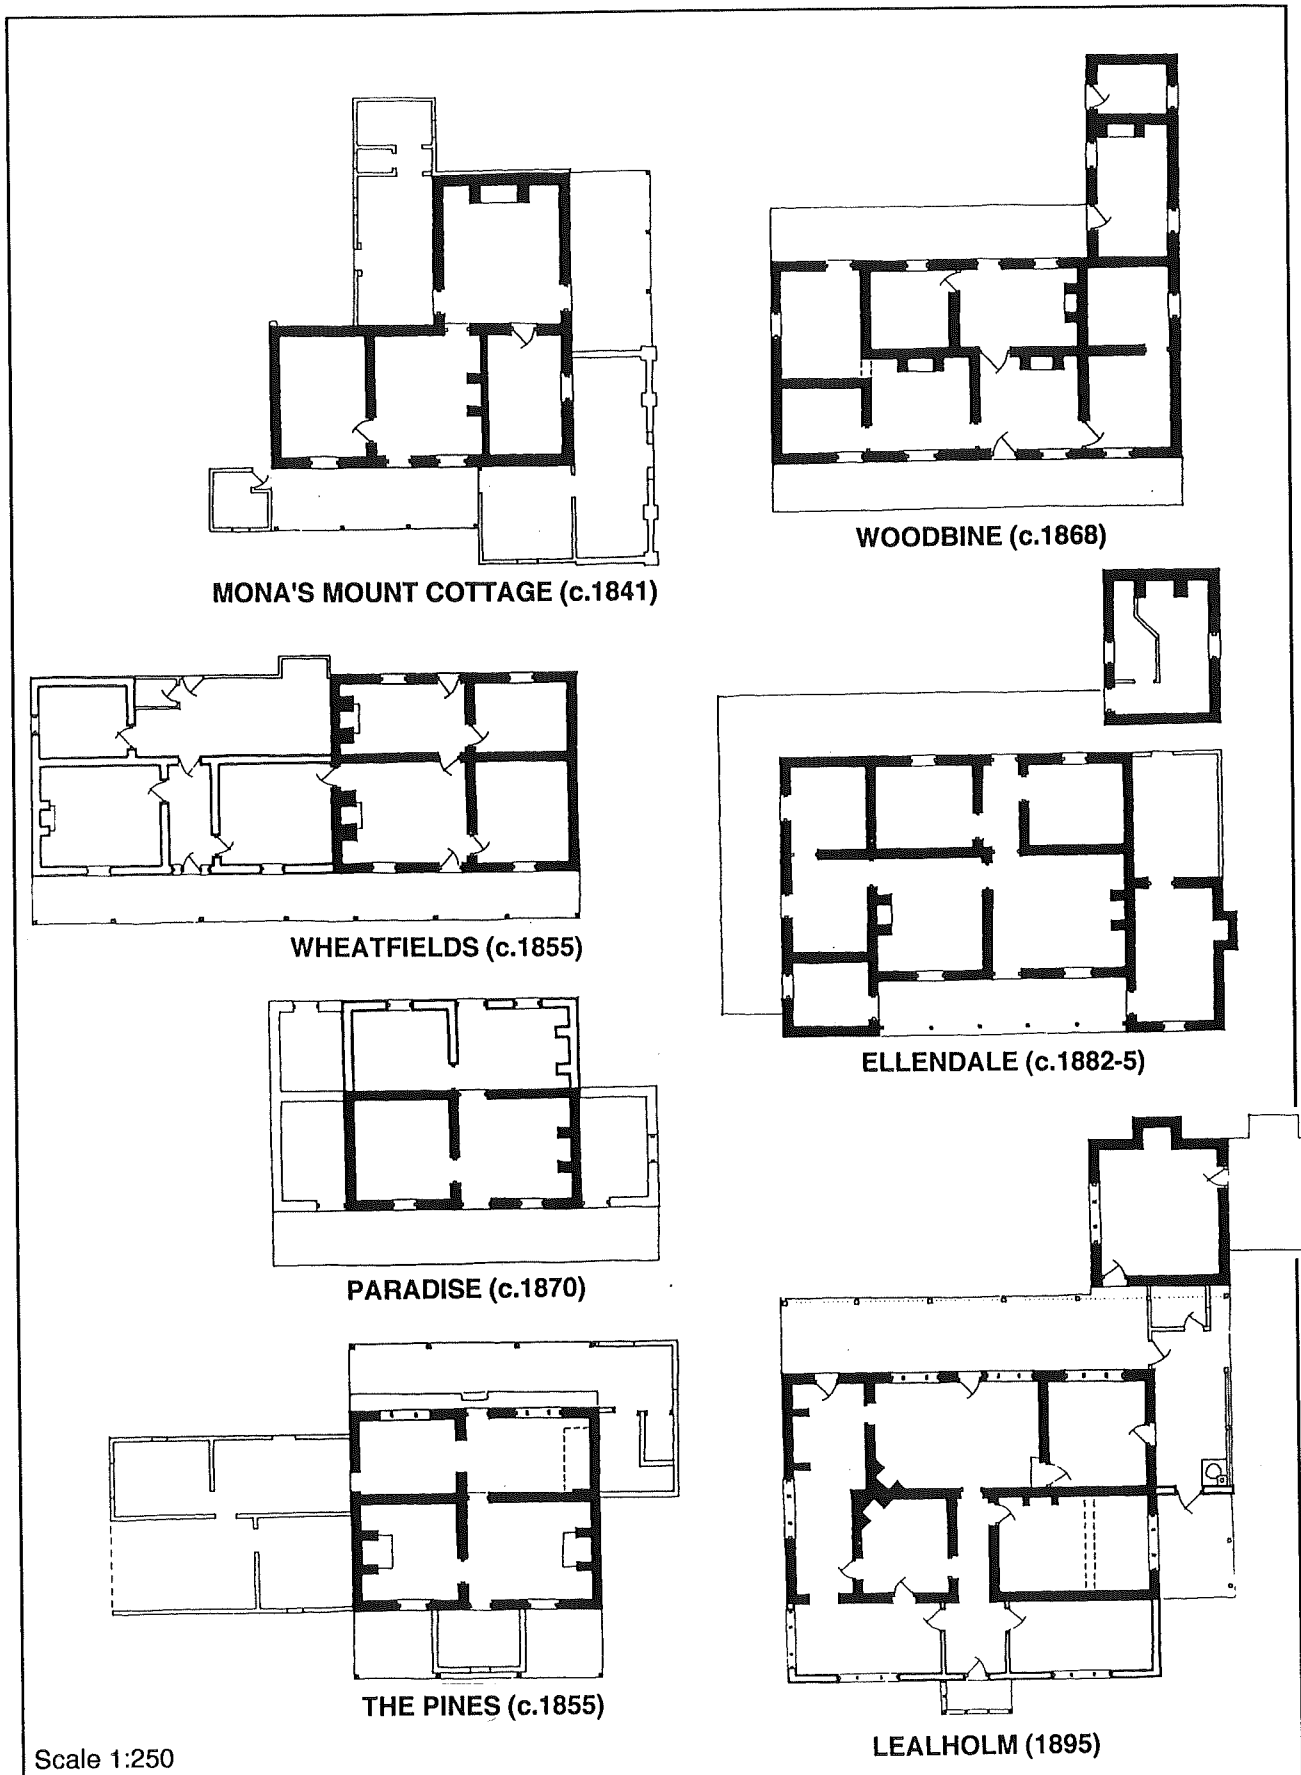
Plan comparison of surviving East Rockingham cottages that were built before 1900.
